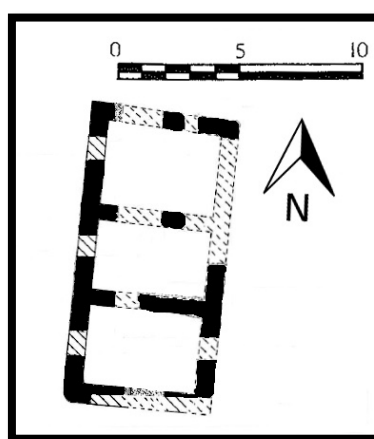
2: Plan of Frere Building 1.i, Dorchester on Thames (after Frere 1962 Fig. 6).
